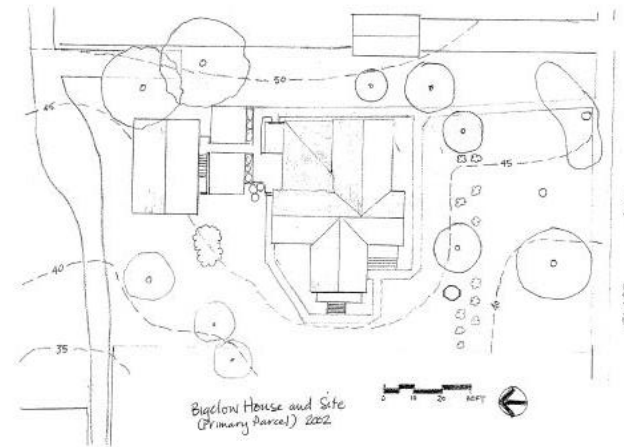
Bigelow House and Proposed Site Plan. 2002. Bigelow House Preservation Association Documents.
